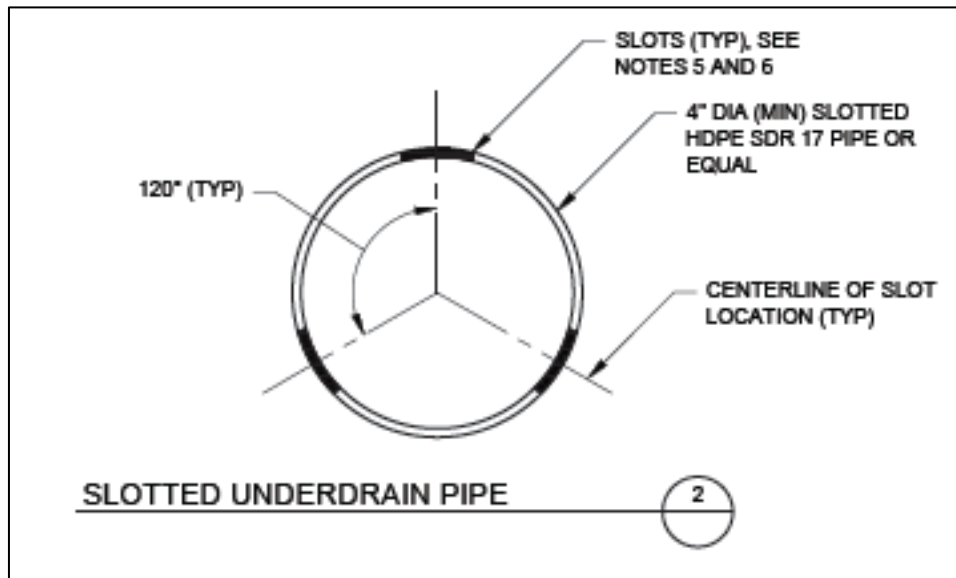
Slotted Underdrain Pipe Detail (Credit: SFPUC and GI Design Guide)
